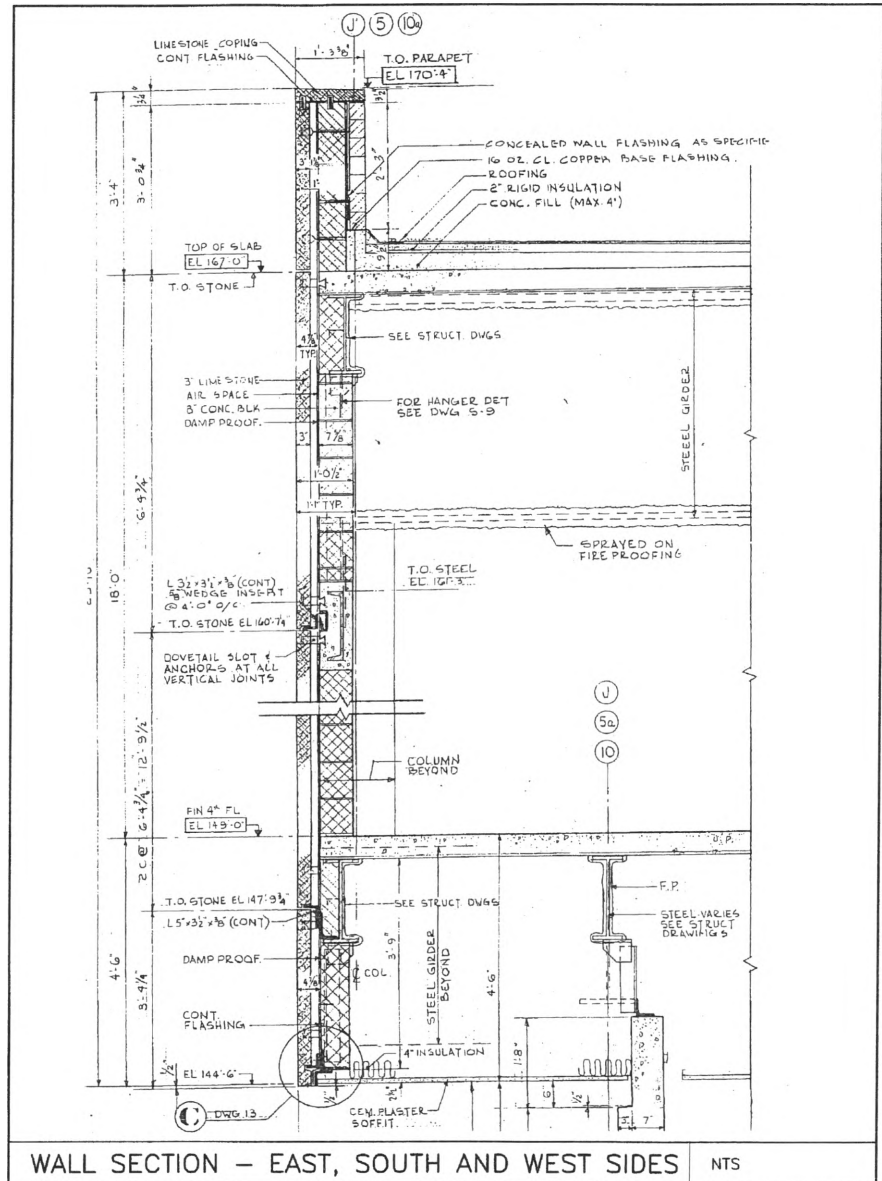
shows the entire wall section and its associated construction details. Our review of this as-built construction detail shows the base of this wall section and how it was assembled relative to the structural frame of the building. The issue of the limestone panel breaking off the building façade became a primary area of concern.
